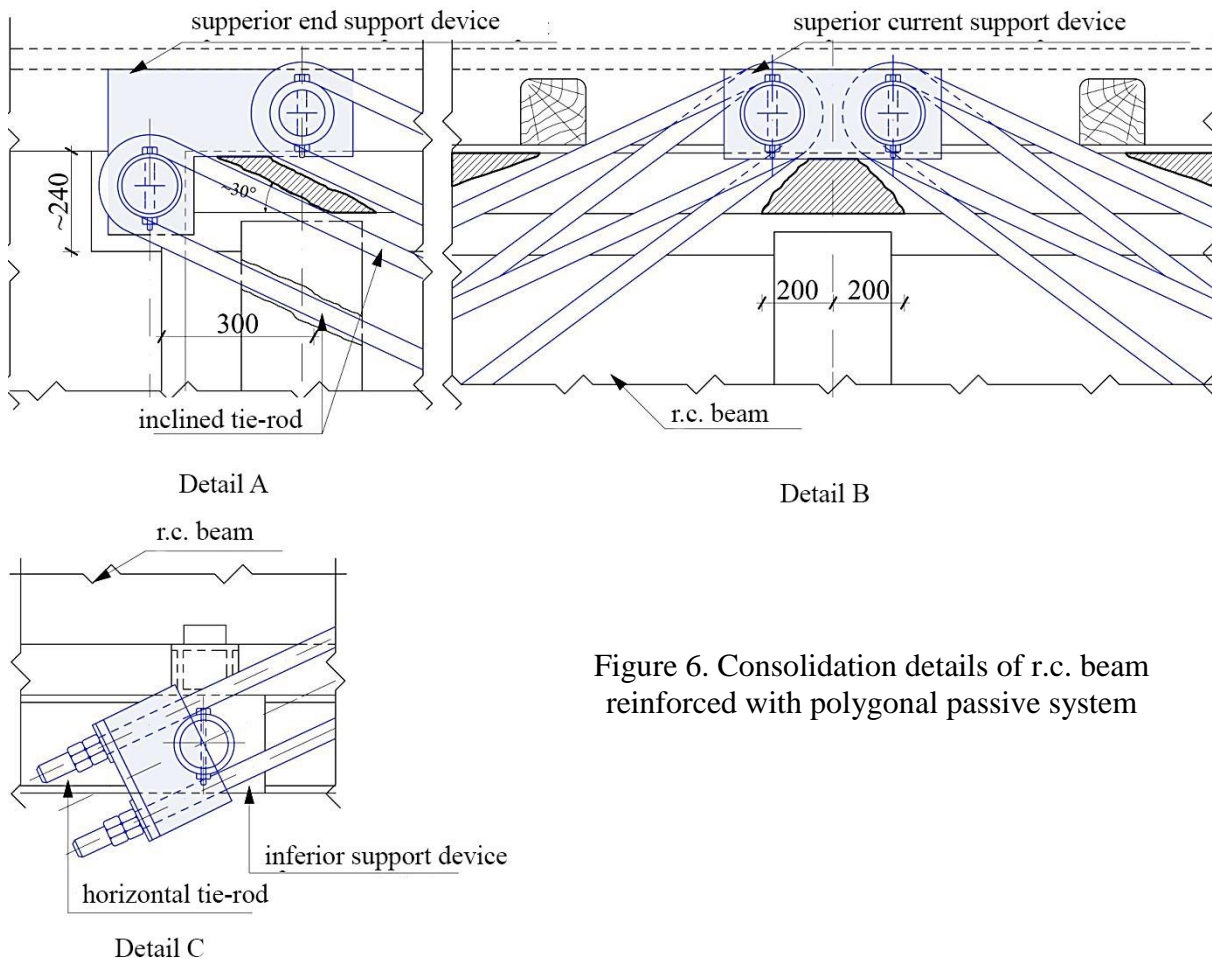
Consolidation details of r.c. beam reinforced with polygonal passive system
